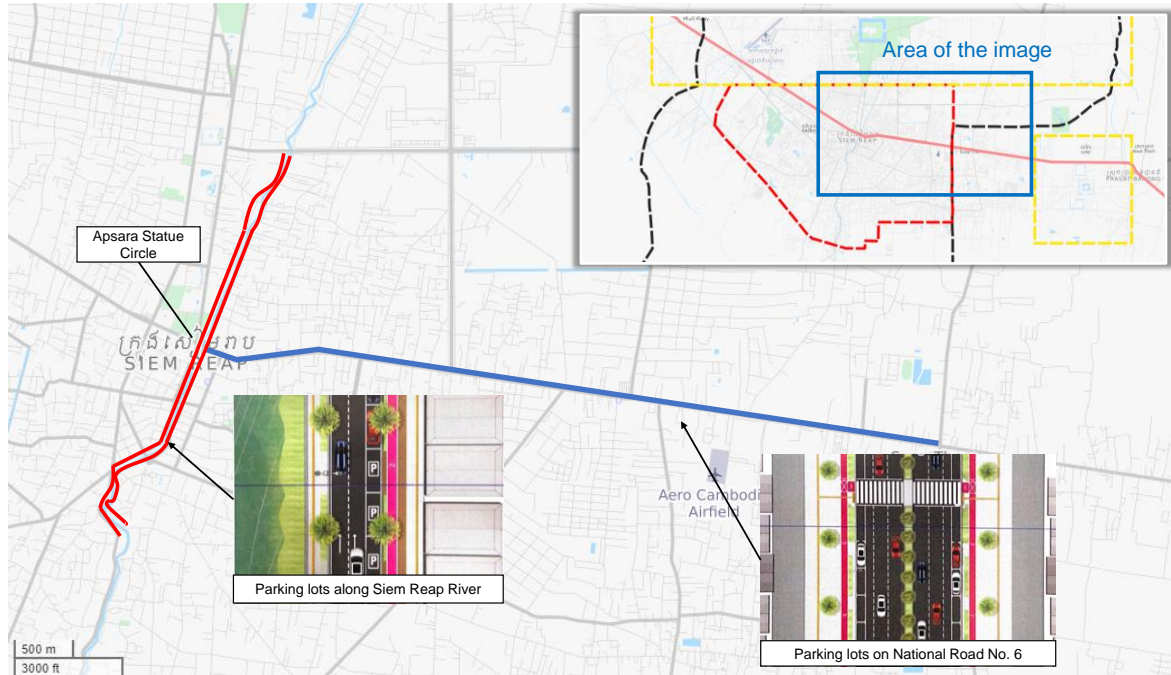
Image of On-street Parking Lot Installed in 38 Road Construction Project
